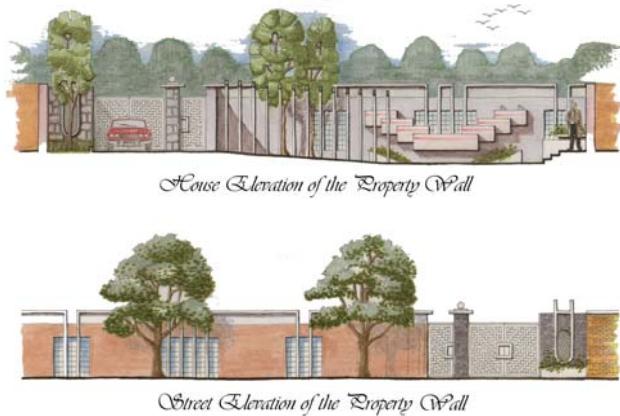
House property wall's private and public Elevations. (Drawn by the author)
